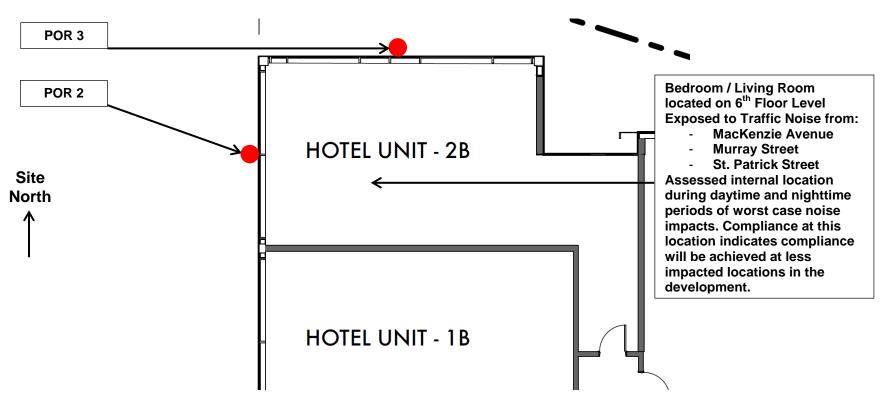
Detailed Plan at POR 2 and POR 3 – 1 Bedroom Unit at Sixth Floor Level - Worst Case (source: architectsAlliance)
